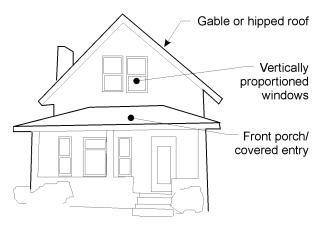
Desirable architectural features for buildings outside of the Downtown Core area.
